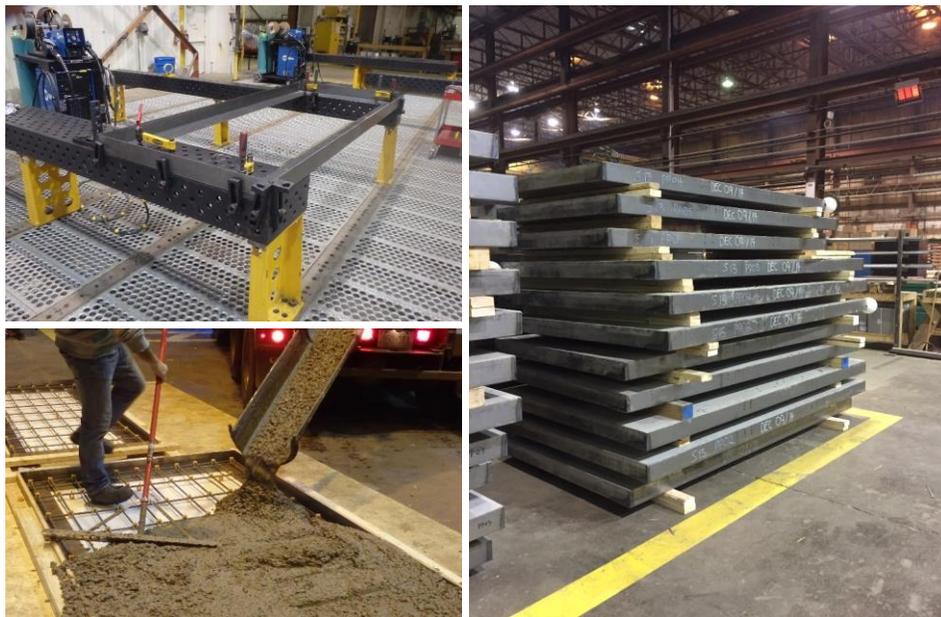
Production of precast concrete panels. Top-left: fit-up of light-gage steel frame using framing table for dimensional control. Bottom-left: concrete pour. Right: concrete panels before aggregation in floor frame.
